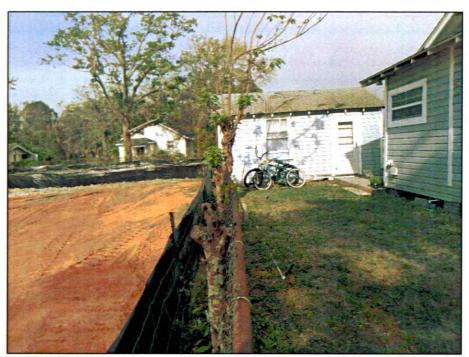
Facing south from West Gimble Street facing the front of the house. The site is located on the south side of the street between E Street and F Street.
